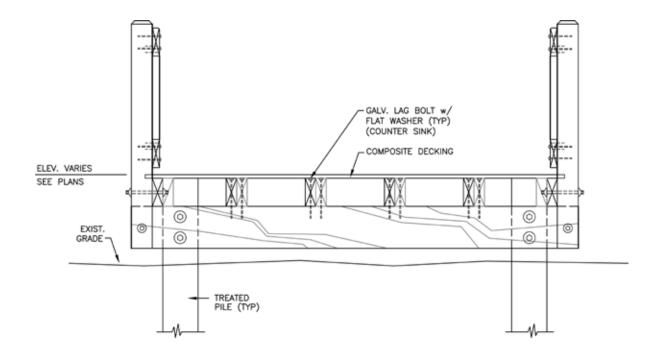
' WEST BILOXI BOARDWALK W/ FIBER REINFORCED DECKING
